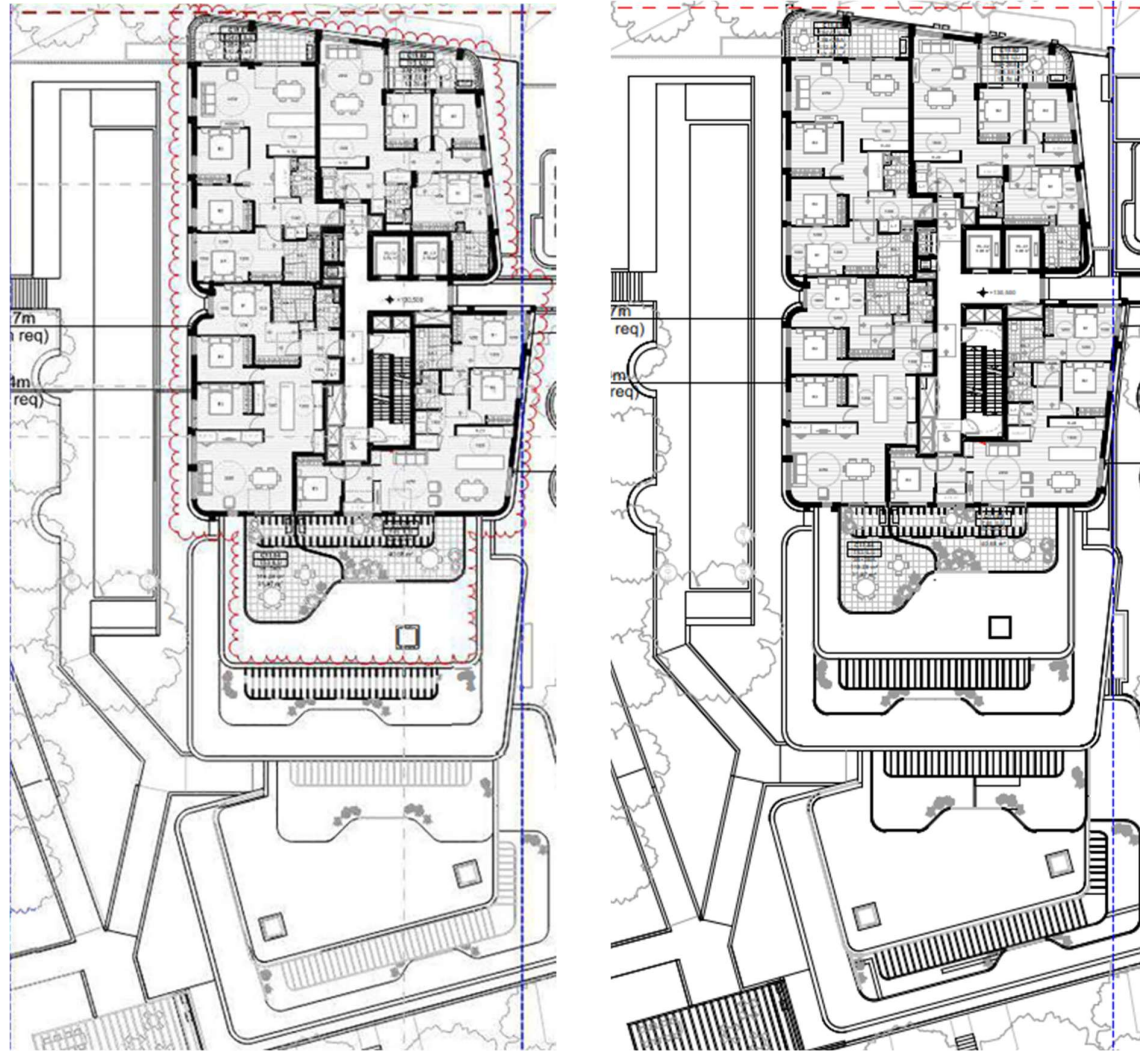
Approved and Proposed Level 11 of Building C (1 of 2)
